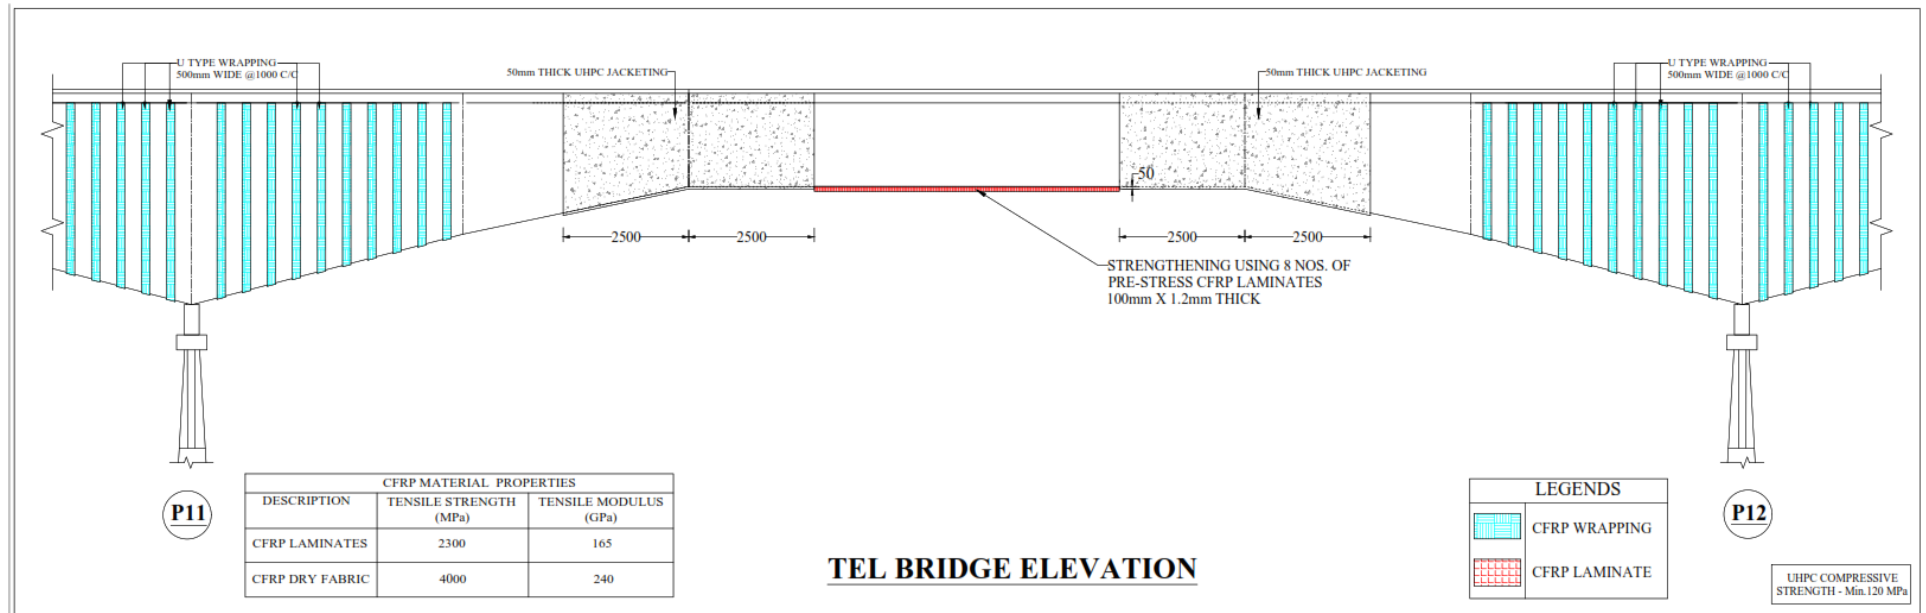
Detail of FRP wrapping to be carried out on the box girder sections after UHPC jacketing.
